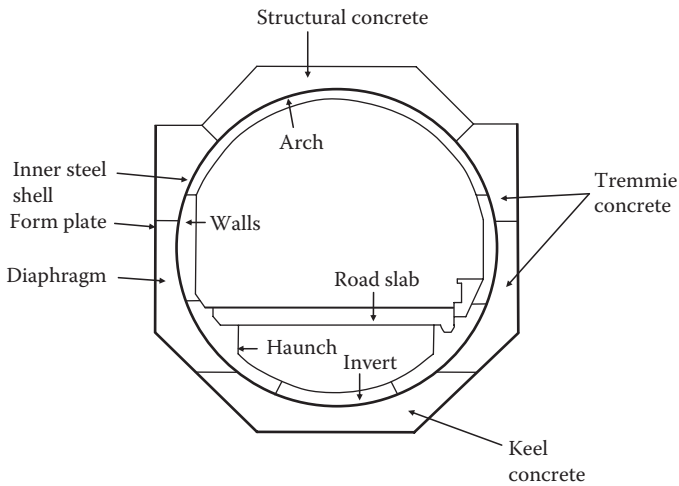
Second Hampton Roads double steel shell arrangement.
